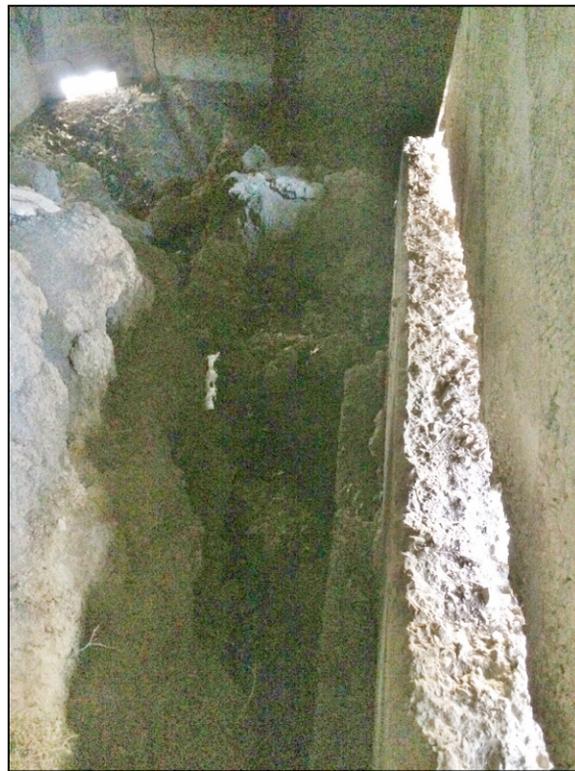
8" shift in failed portion of south abutment lower east wingwall (looking north)
